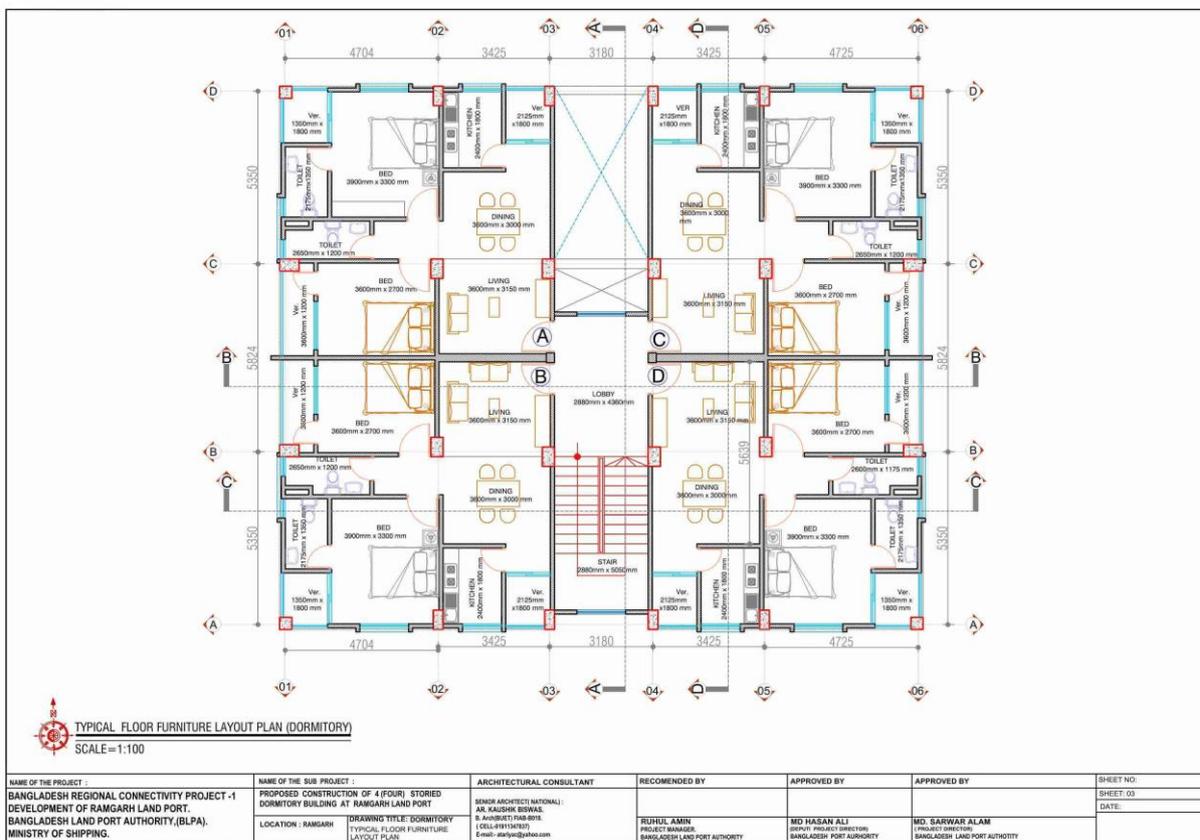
Dormitory Building with Layout Plan of Ramgarh Land Port
